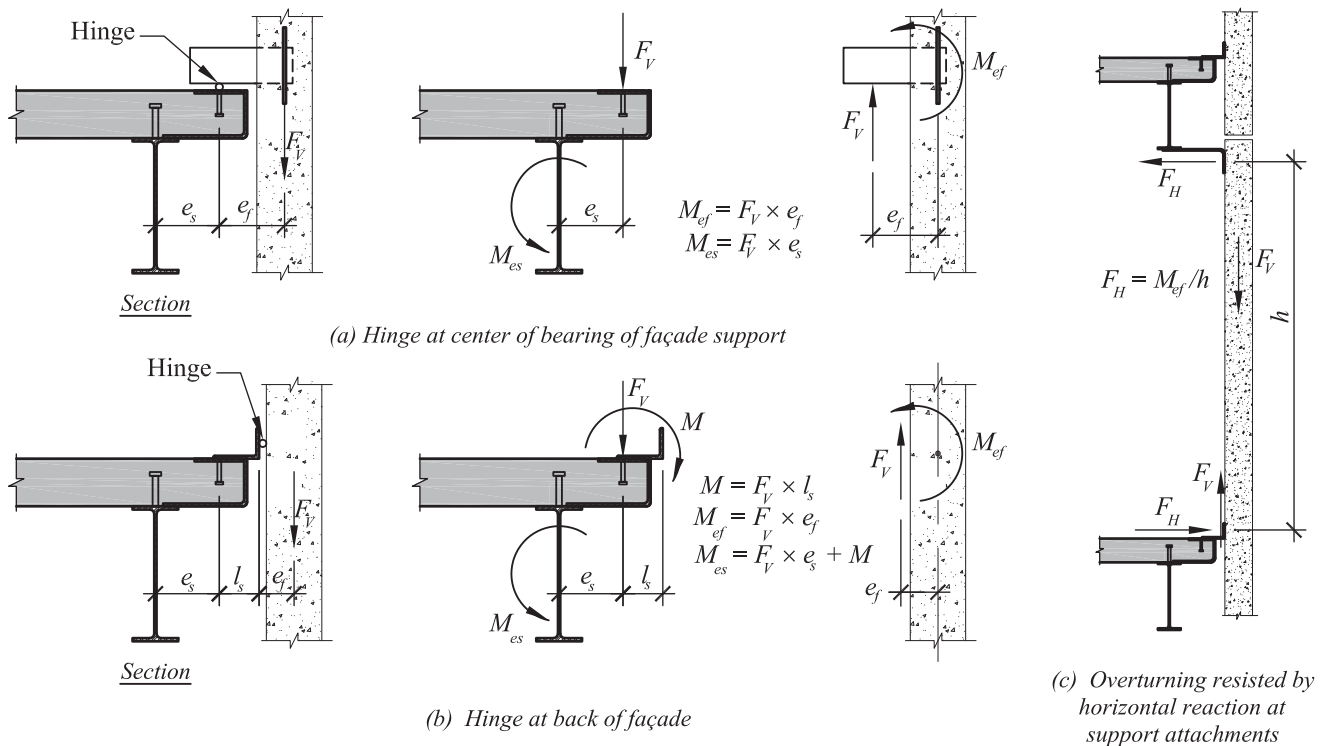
Effects of assumed hinge location and eccentricity on structure and façade.
